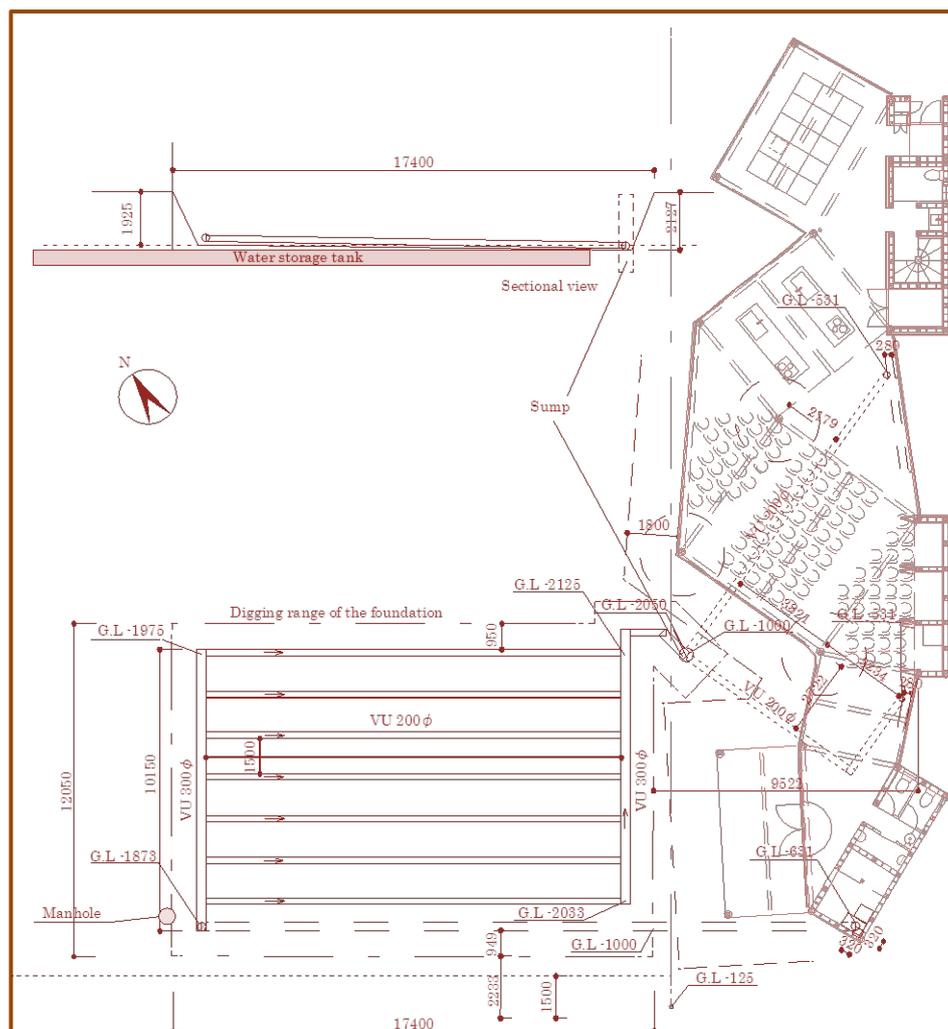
Plan of earth tube community house/tubing diagram and measurement locations.
